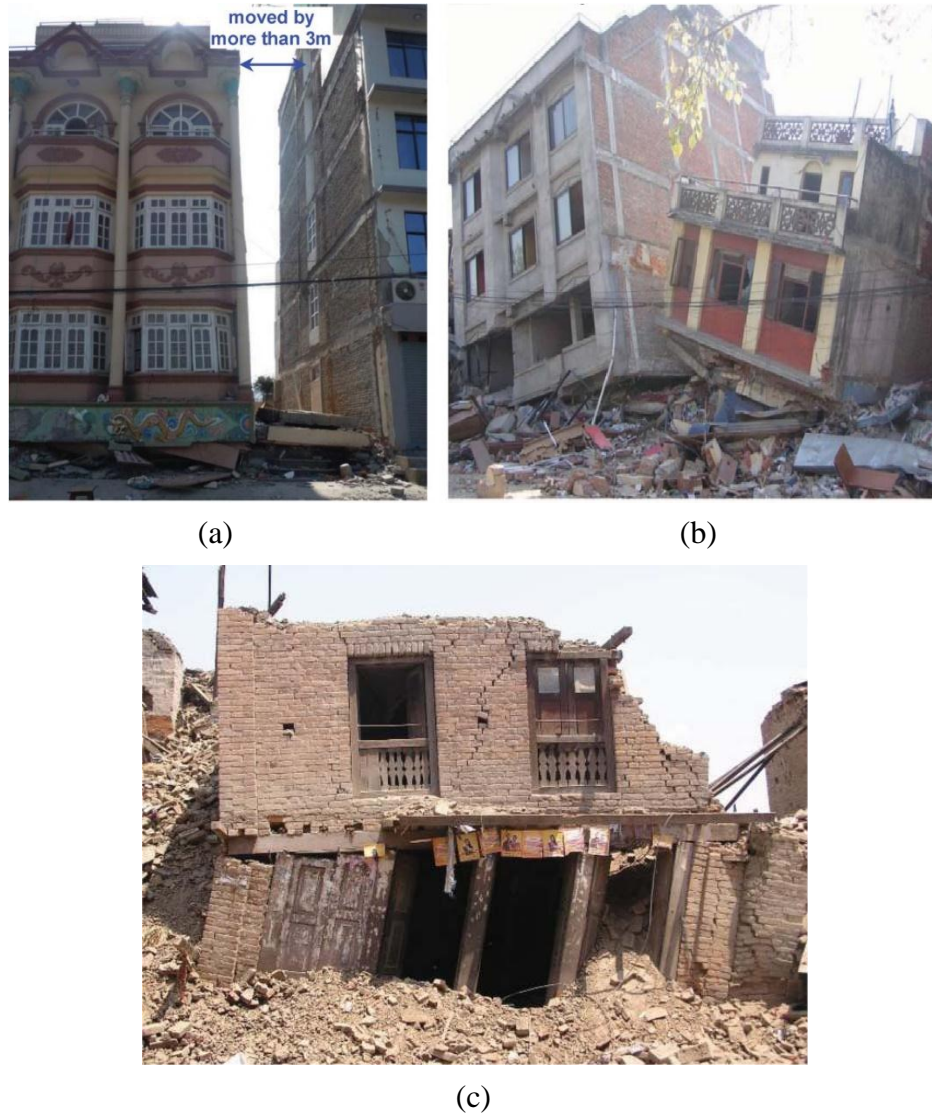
Example damage following the 2015 Gorkha earthquake: (a) a four-story RC building moved approximately 3 m horizontally from an adjacent building in Sitapaila, Kathmandu, (b) soft story failure of two adjacent buildings in Sitapaila, Kathmandu, and (c) collapse of a three-story URM building in Nikosera, Bhaktapur (Rai et al. 2016).
